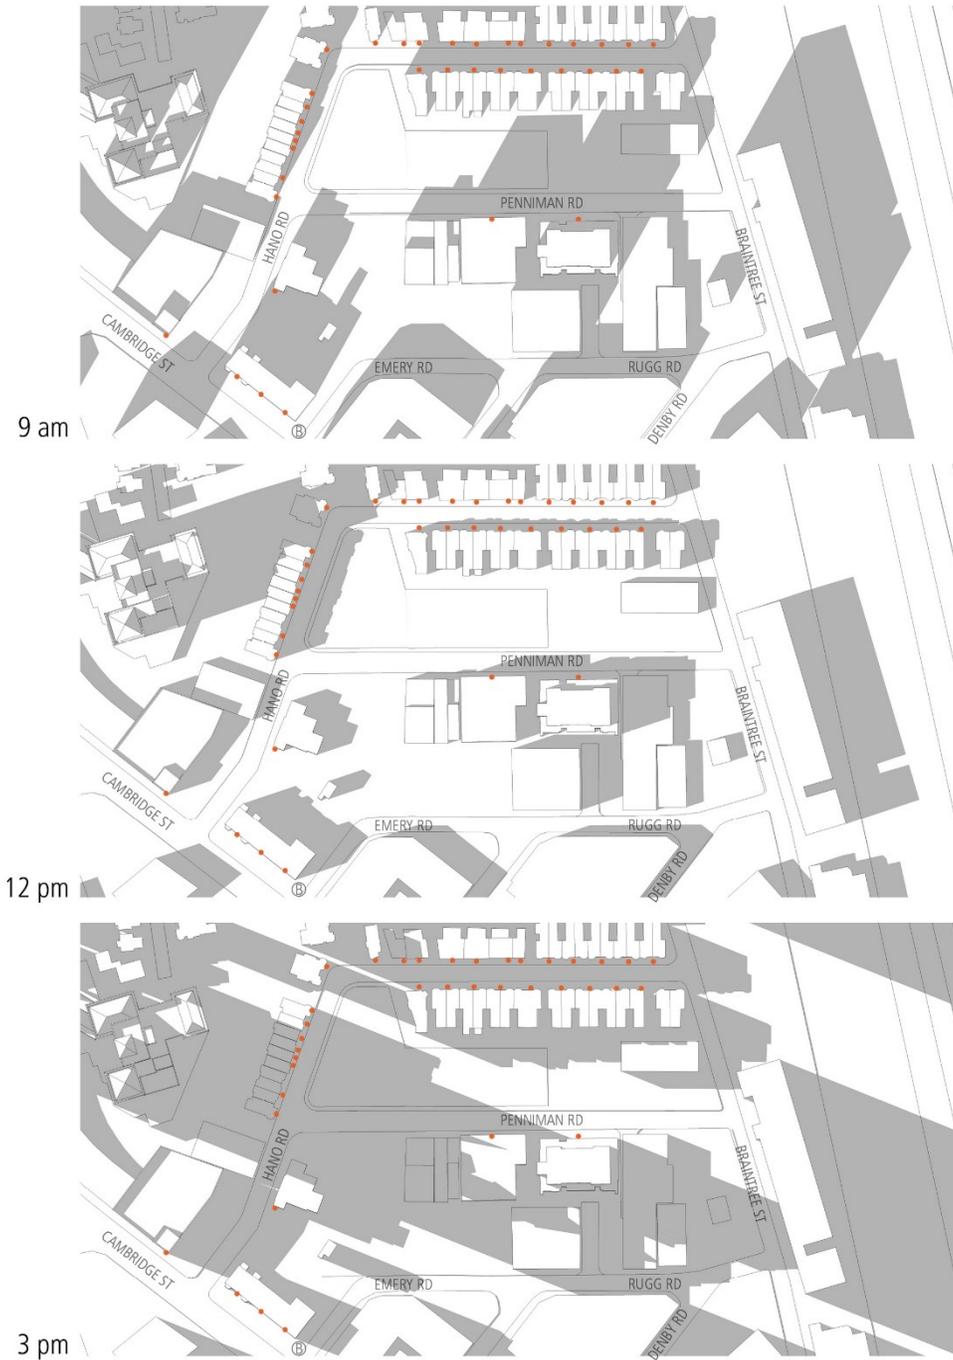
Shadow Studies, September/March 21st – New Proposal
